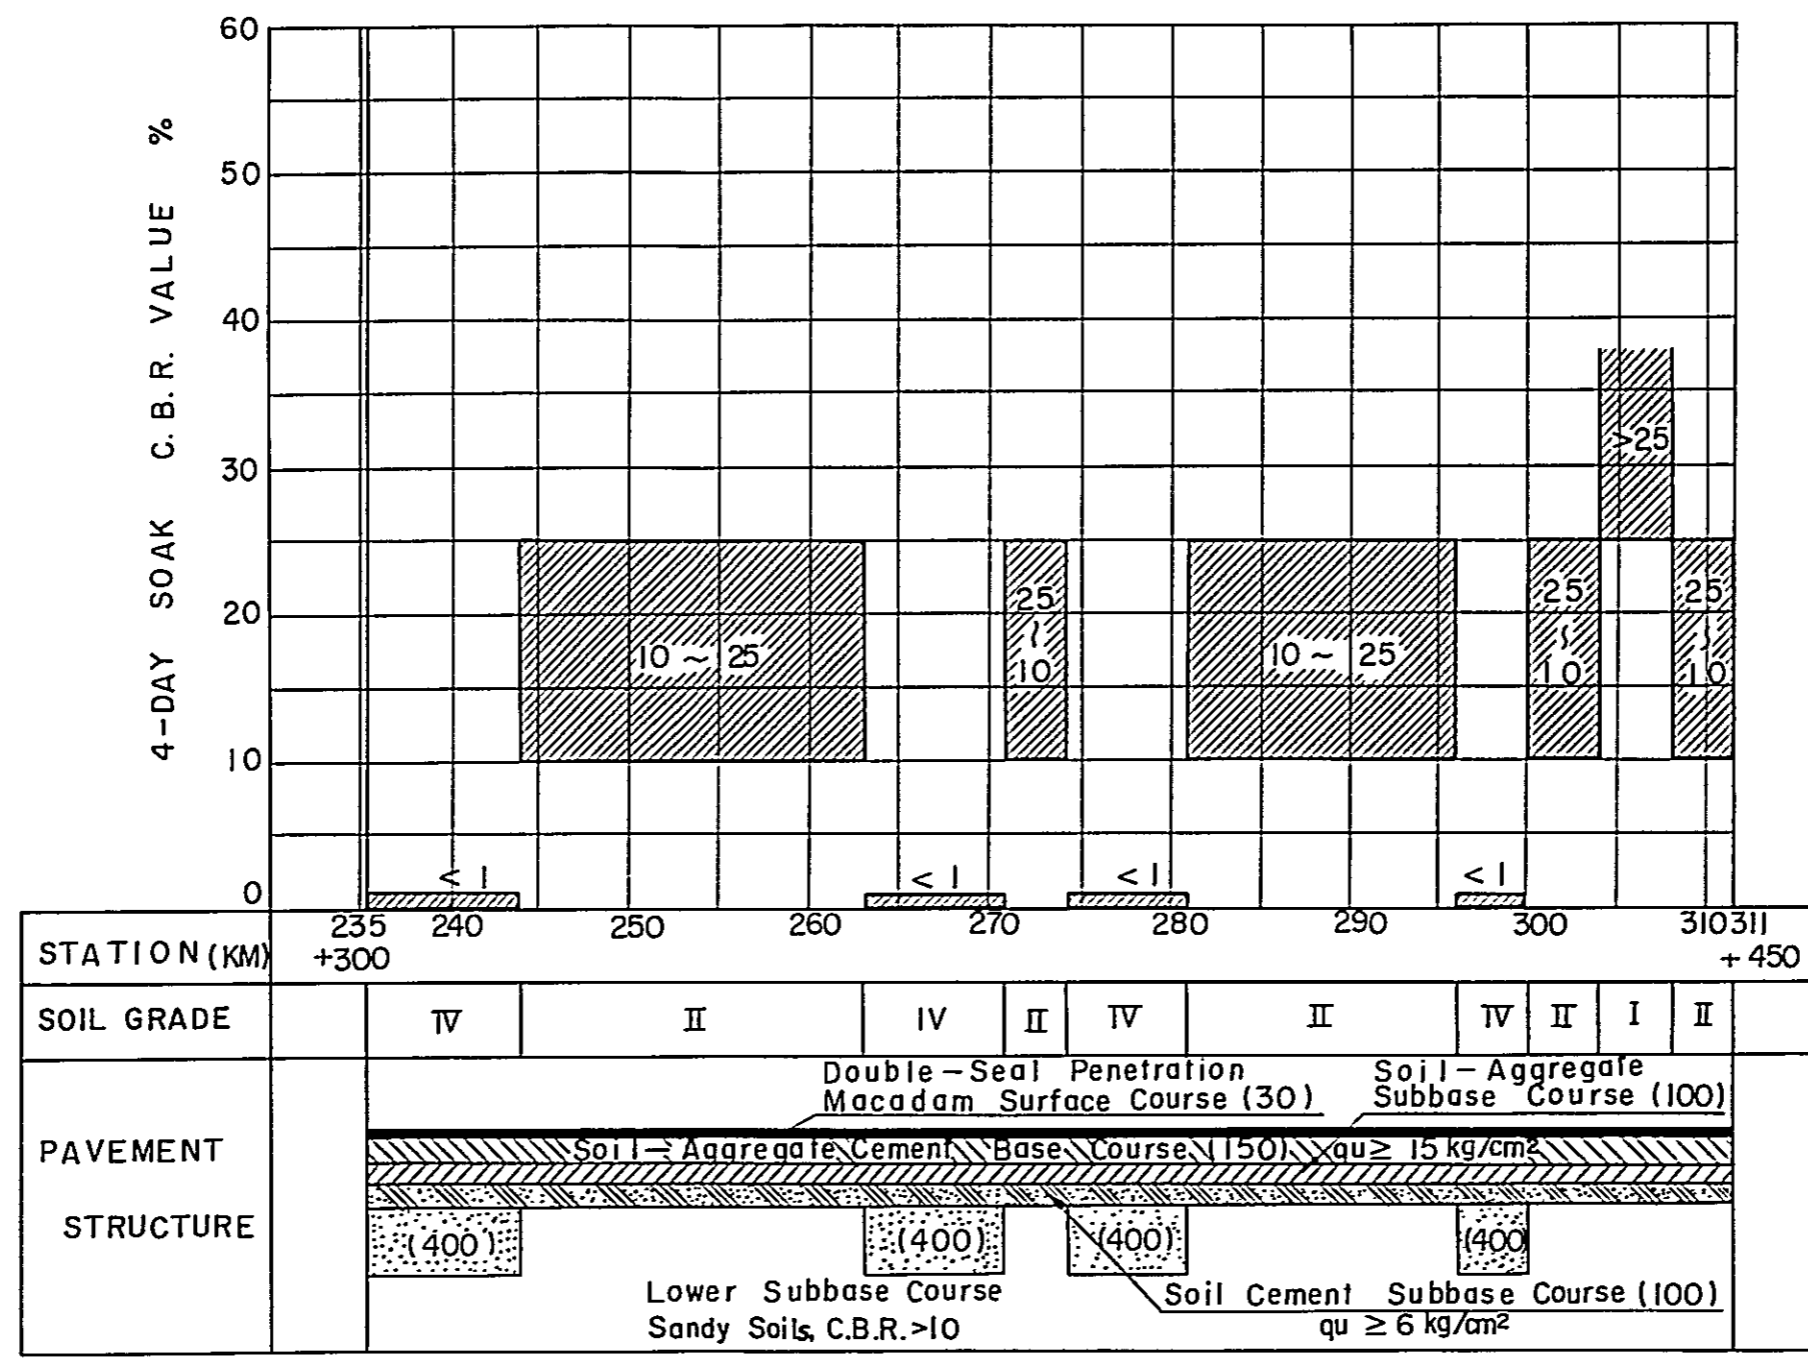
SOUTHERN COASTAL LINK ROAD PROJECT SECTION - 4 (KIRANJERANGE ~ LINDI) PAVEMENT DESIGN FOR PLAN A
